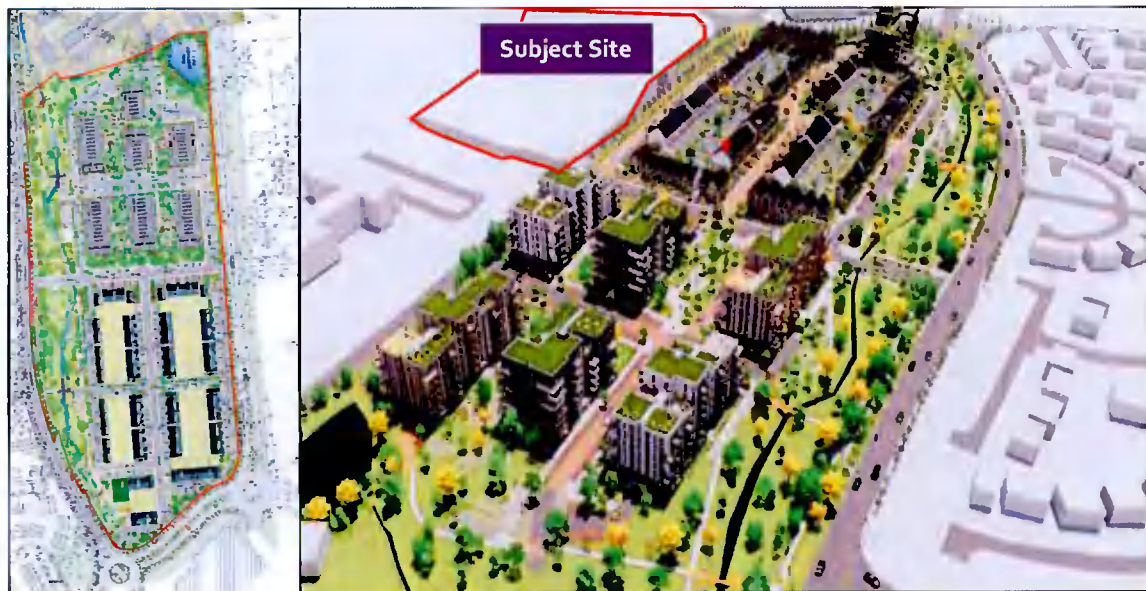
Proposed Site Plan Layout under SHD3 ABP-306602-20
